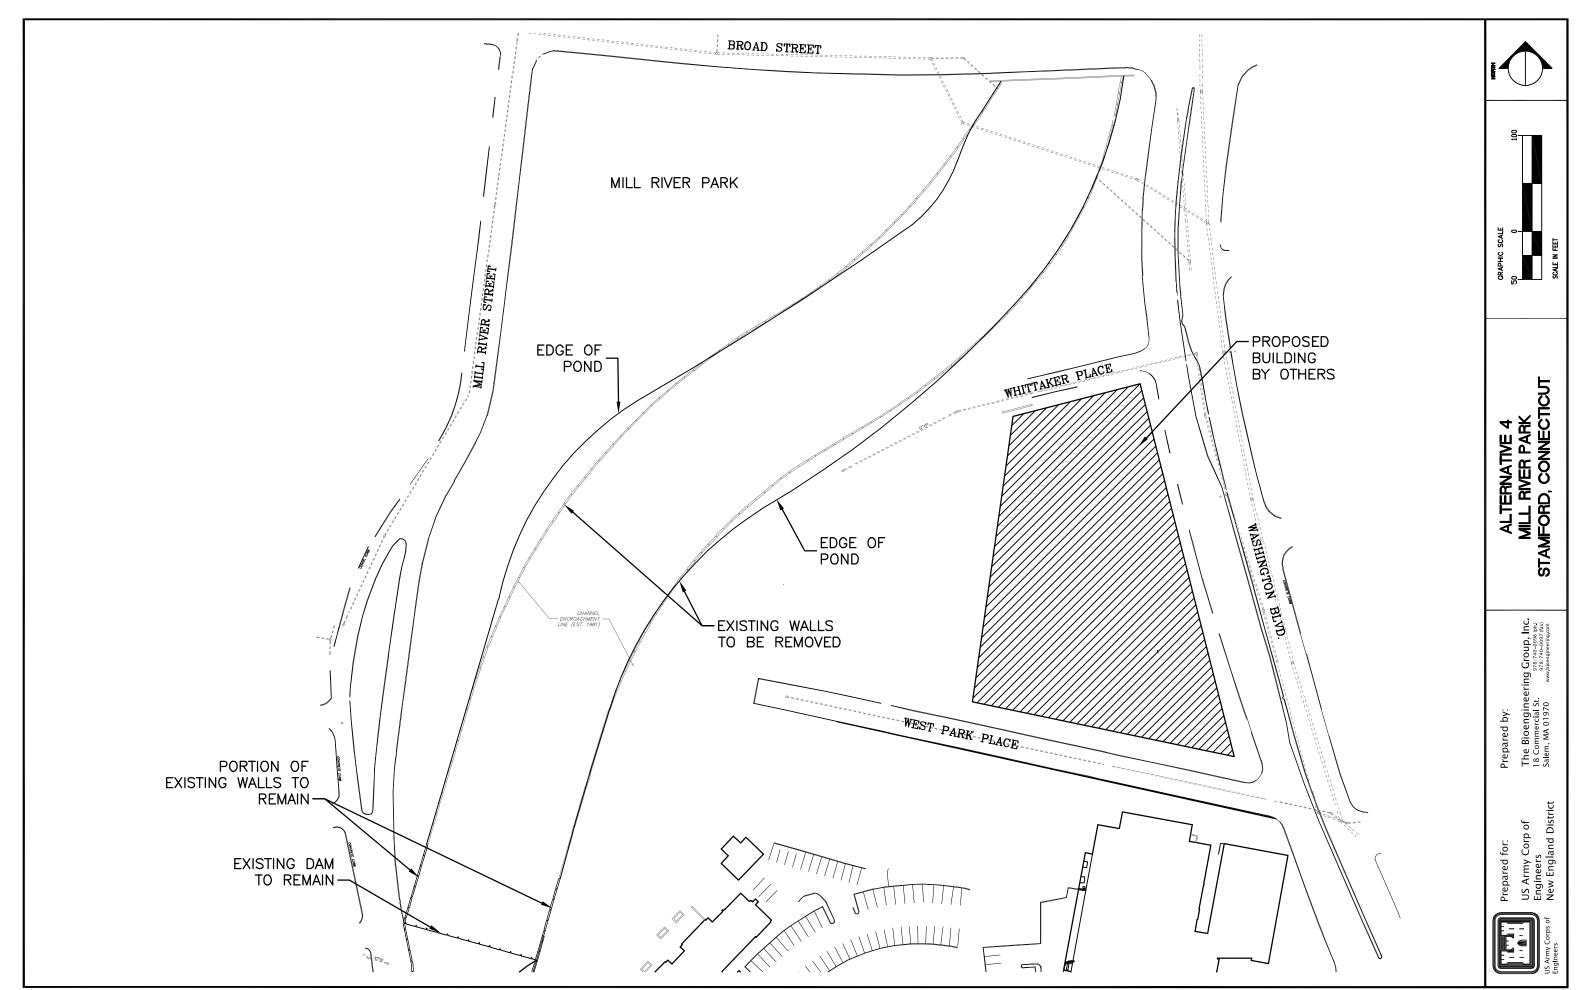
Alternative 4 Concept- Partial Removal of Concrete Retaining Walls
